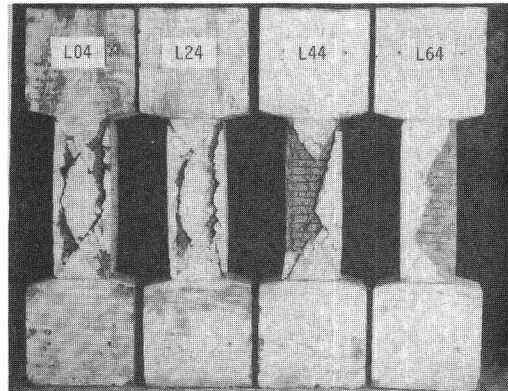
Failure Modes of Diagonally Reinforced Columns under Cyclic Reversed Loading
